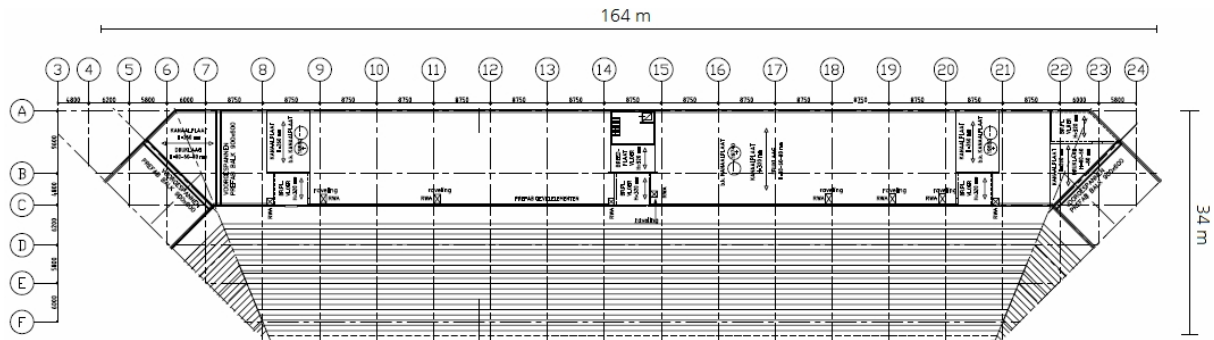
Structural plan for the 3<sup>rd</sup> floor
